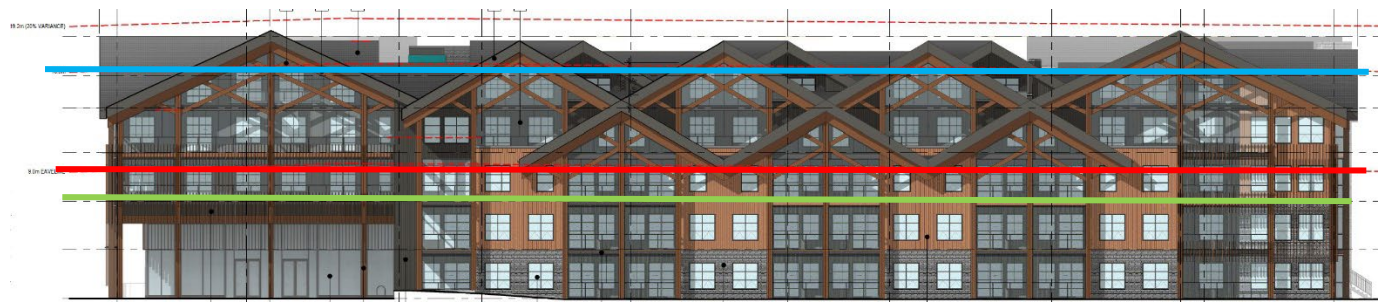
Front (North) Elevation Showing 7.0m Maximum Eaveline Height in Green, Proposed 9.0m Eaveline Height in Red, and 16.0m Maximum Building Height in Blue.
